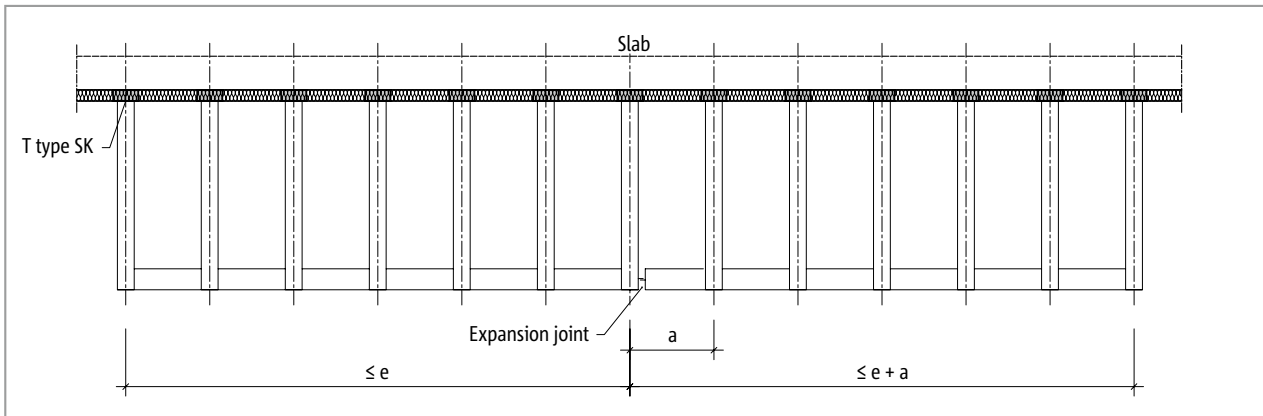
Schöck Isokorb® T type SK: Maximum expansion joint spacing  $e$
